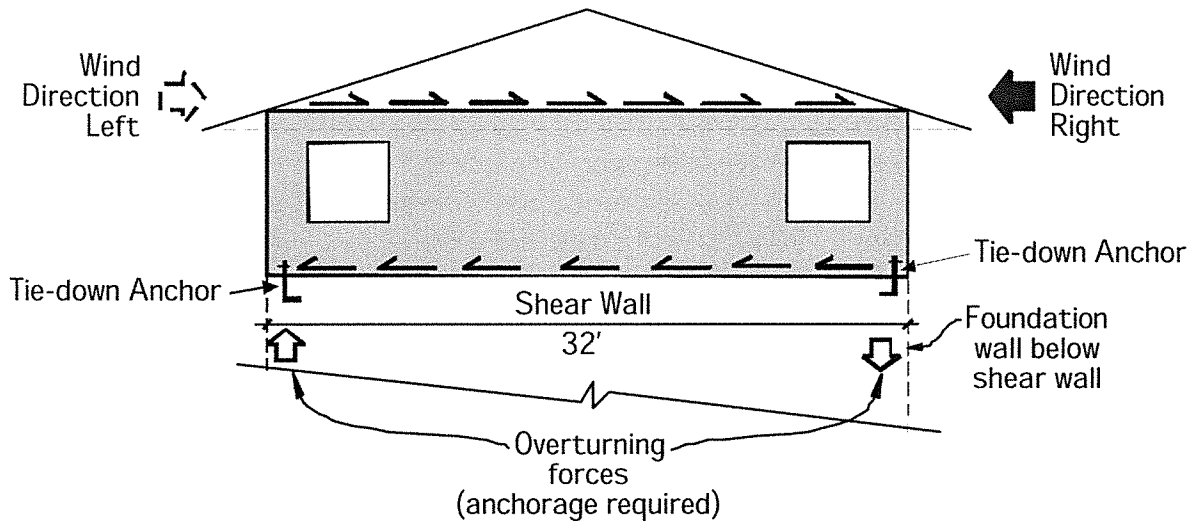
Transverse Shear Plane A Perforated Shear Wall Empirical Method
